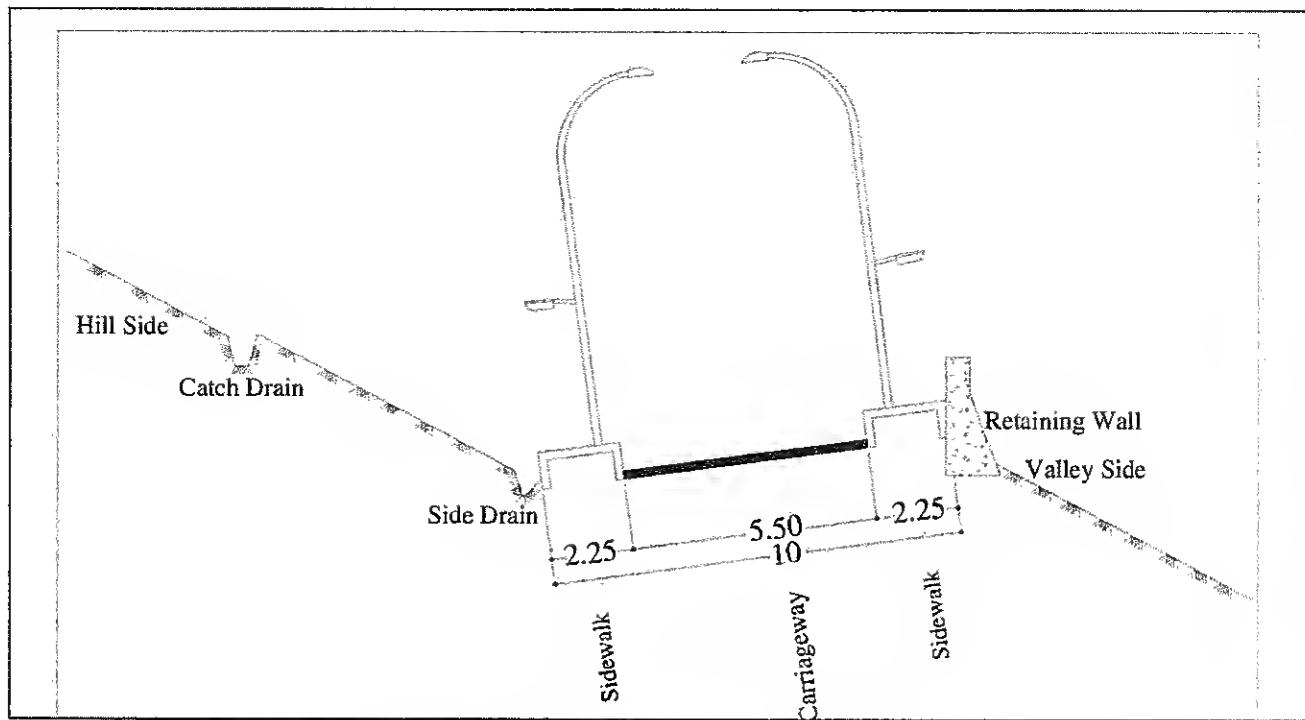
Typical Cross Section for Local Streets - Hilly Terrain
